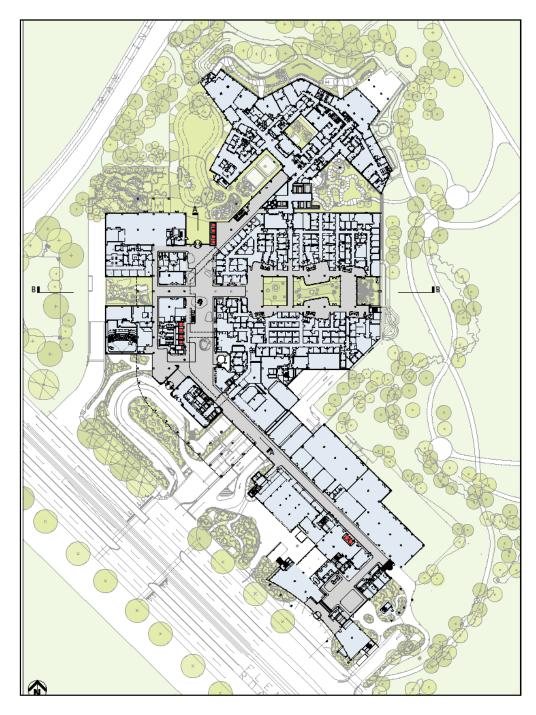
37 Ground Floor Plan - Royal Children Hospital
